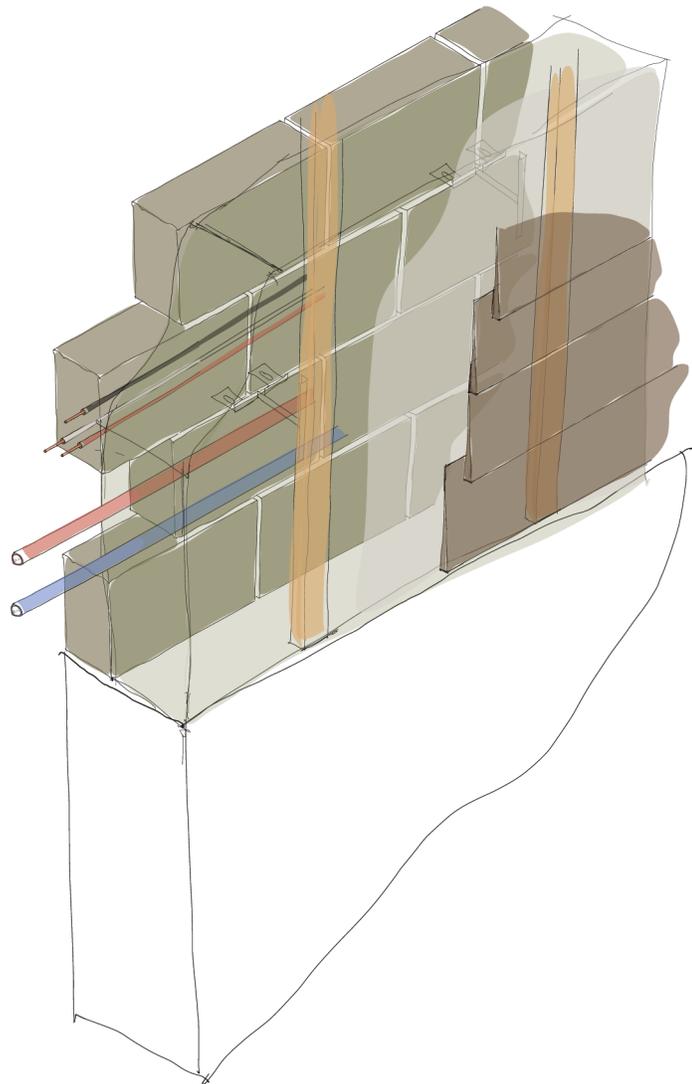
Wall assembly using 6" pre-cast hempcrete blocks with lime mortar, servicing conduit then filled with 8" hempcrete wall fill, vertical wood strapping, breathable building wrap, finished with horizontal wood cladding.
